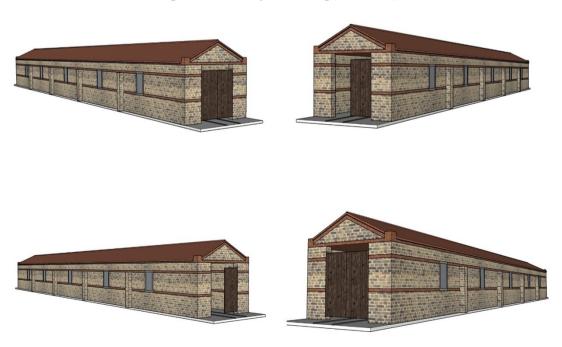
3D views of Cer Building (Sinan, 2019)
